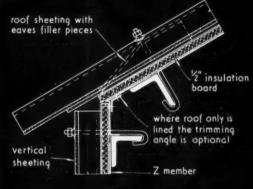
DETAIL SHOWING ARRANGEMENT OF Z MEMBER, BOARD AND PURLIN.
